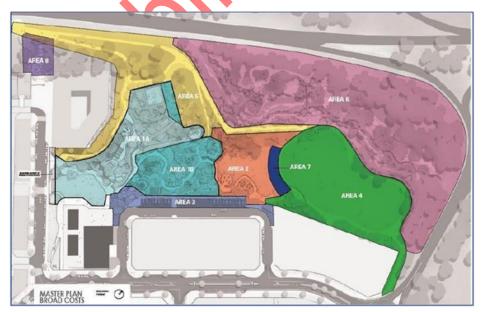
Stages of public open space construction (concept design by Playstreet)
